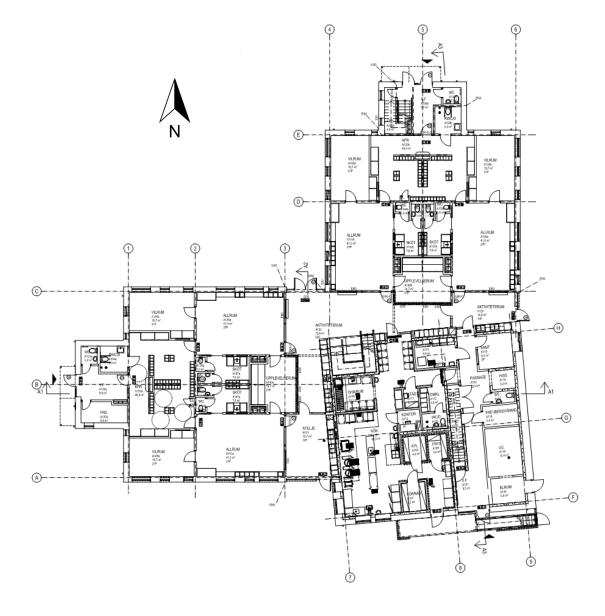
Model preschool Grönskan – first floor plan (Göteborgs Stad Lokalförvaltningen, 2017d).
